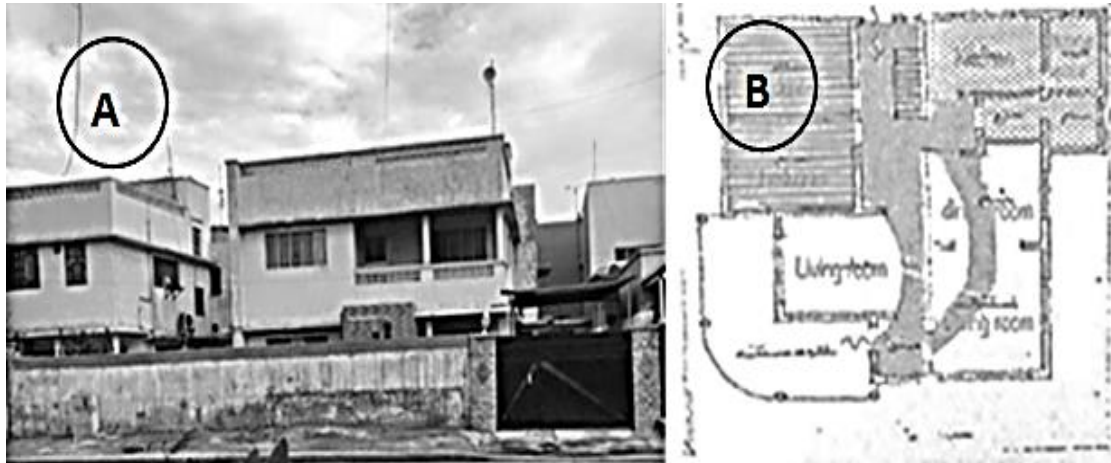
A. modern Baghdadi house was built in the 1970s. B. Example of a plan of a modern house in Baghdad by (Al-Beirouti, 1992)
